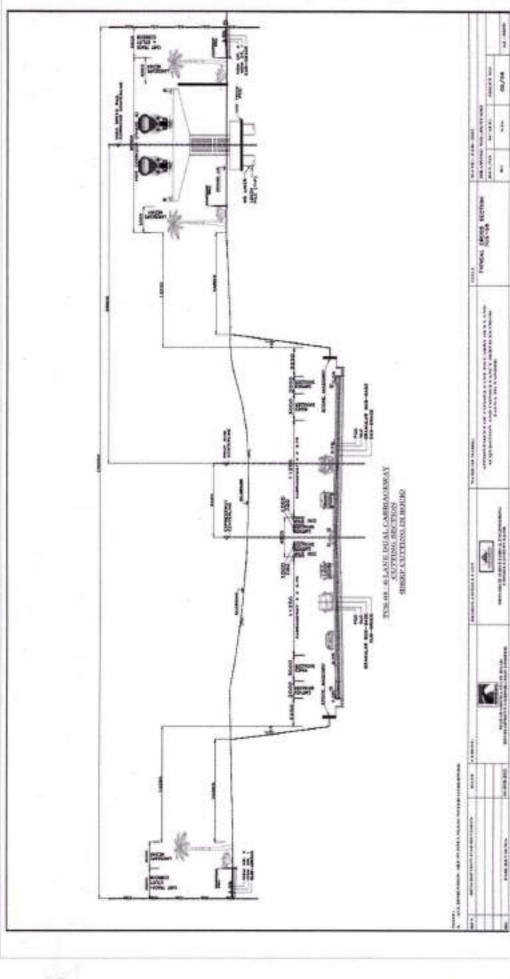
D: (Typ.) Cross Section of Proposed Alignment
